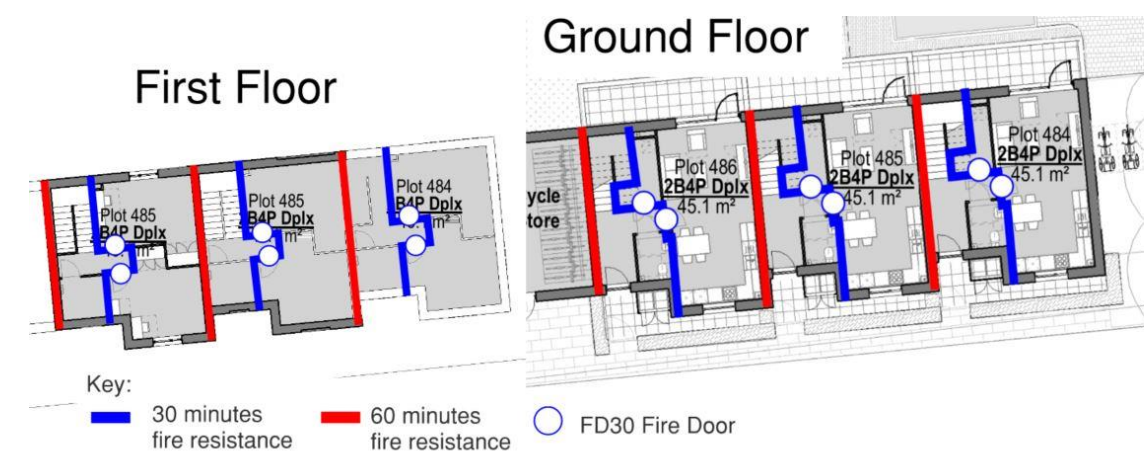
Typical layout of houses provided with a protected entrance hall (Block H)
